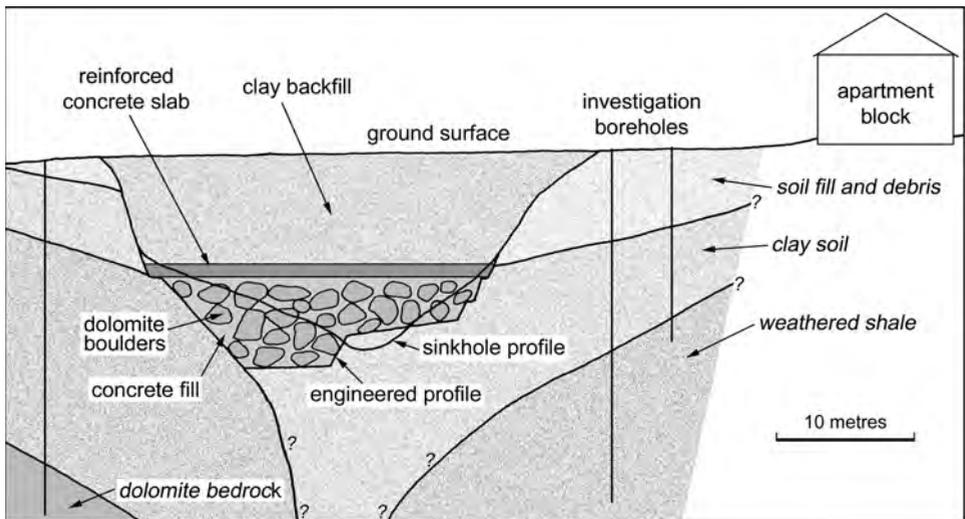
Cross section through the Macungie sinkhole with its engineered remediation and backfill.
